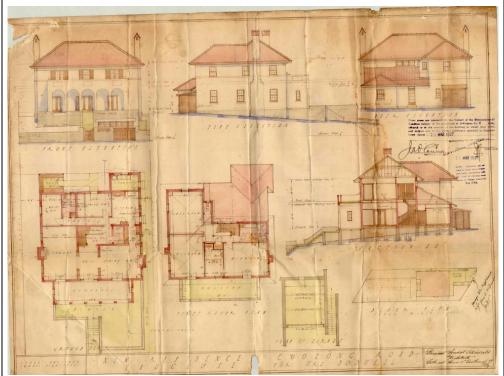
Original plans of the subject dwelling under BA1927/50 (Source: Woollahra Council Archives)
